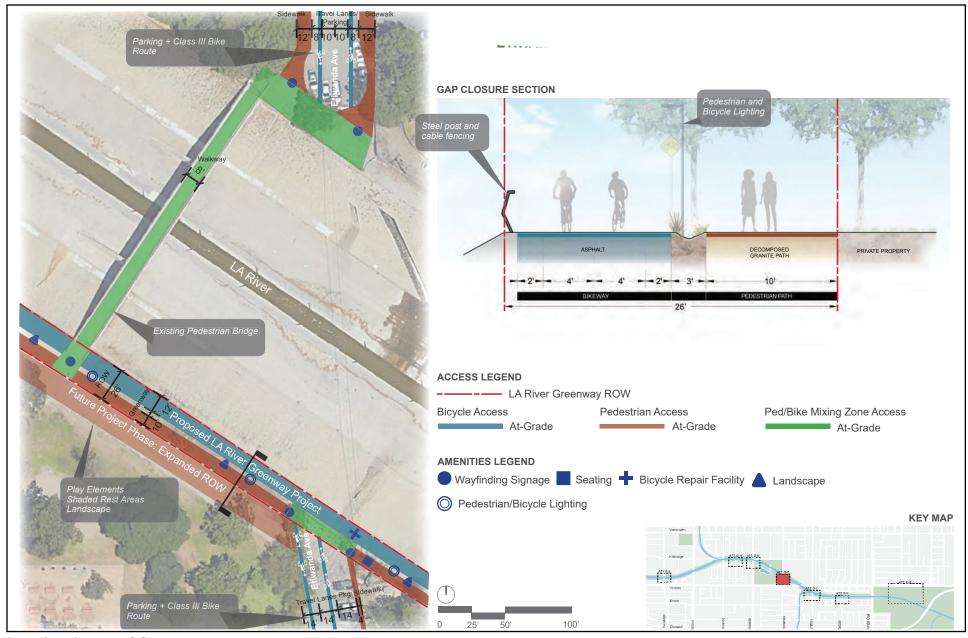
BIKEWAY ACCESS – AMIGO AVENUE
